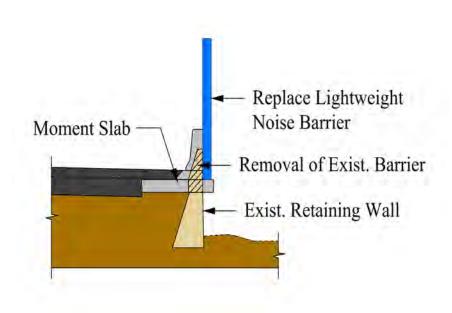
Our Team's Design Concept for Modifying Existing Retaining Wall and Replacement of Lightweight Noise Barrier along I-64 EB - Station 125+00 RT
